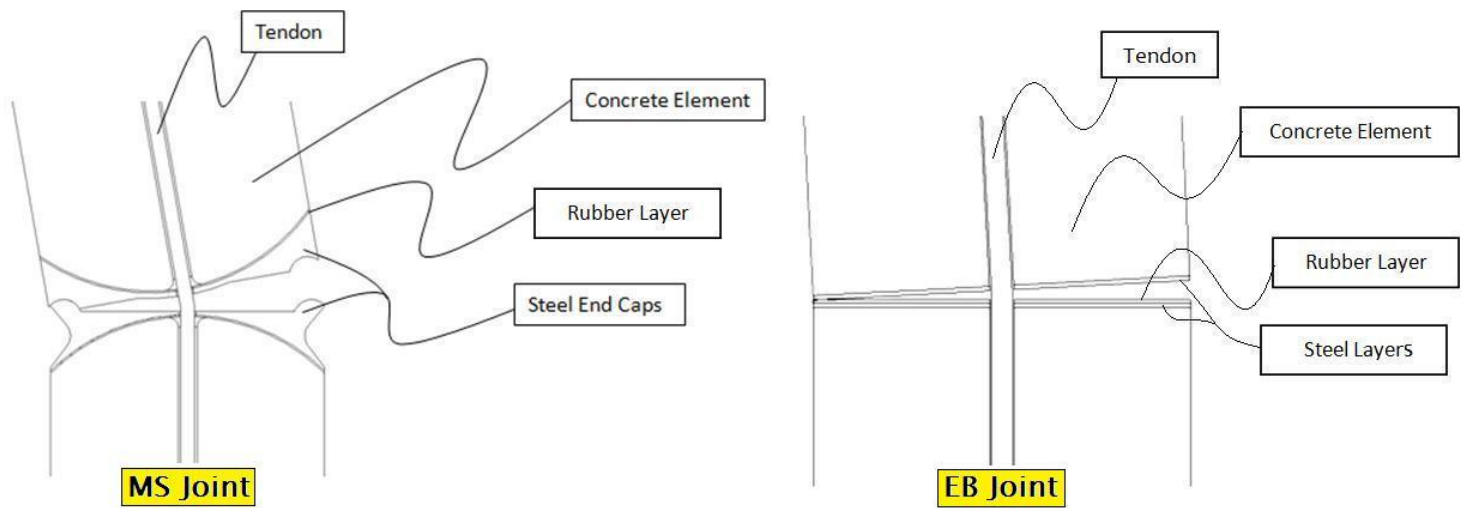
MS Joint and EB Joint, Cross Sections; Under High Deflection
